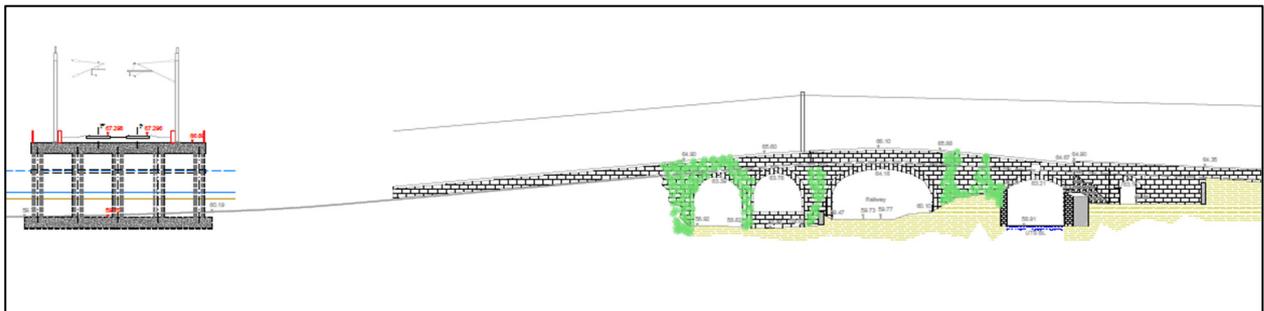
Option 4b Cross-section along Jackson's bridge and UBG22 underbridge
